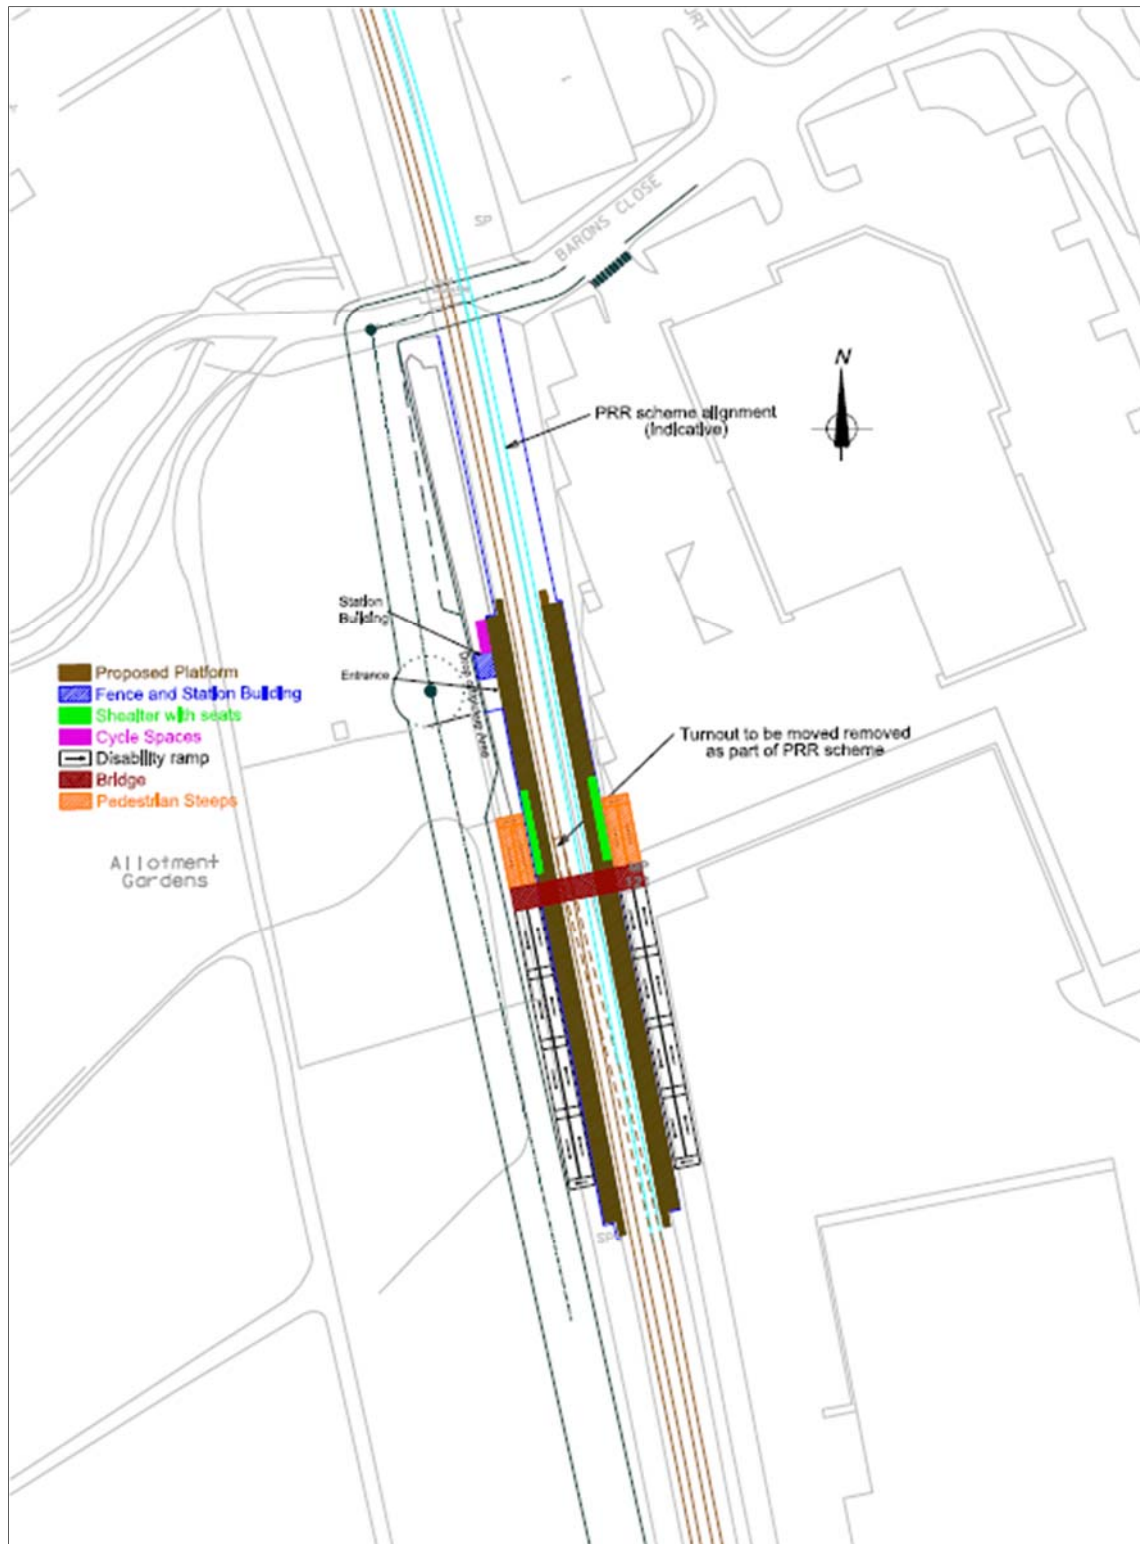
Ashton Gate station – layout Option 2b (station layout and new access road)
